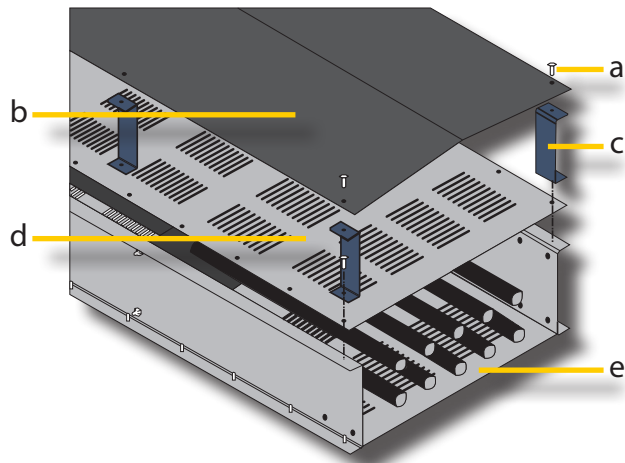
Typical Metal-Enclosed Cable Bus Wall Assembly
